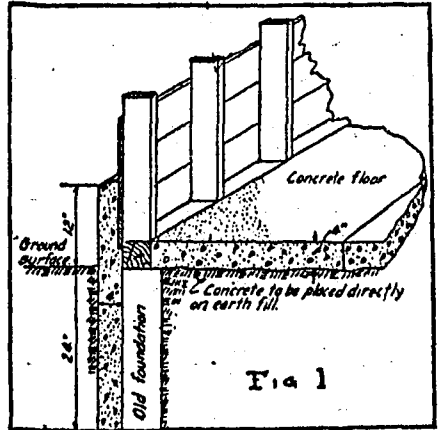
How an Old Foundation May Be Ratproofed and a Concrete Floor Installed.
